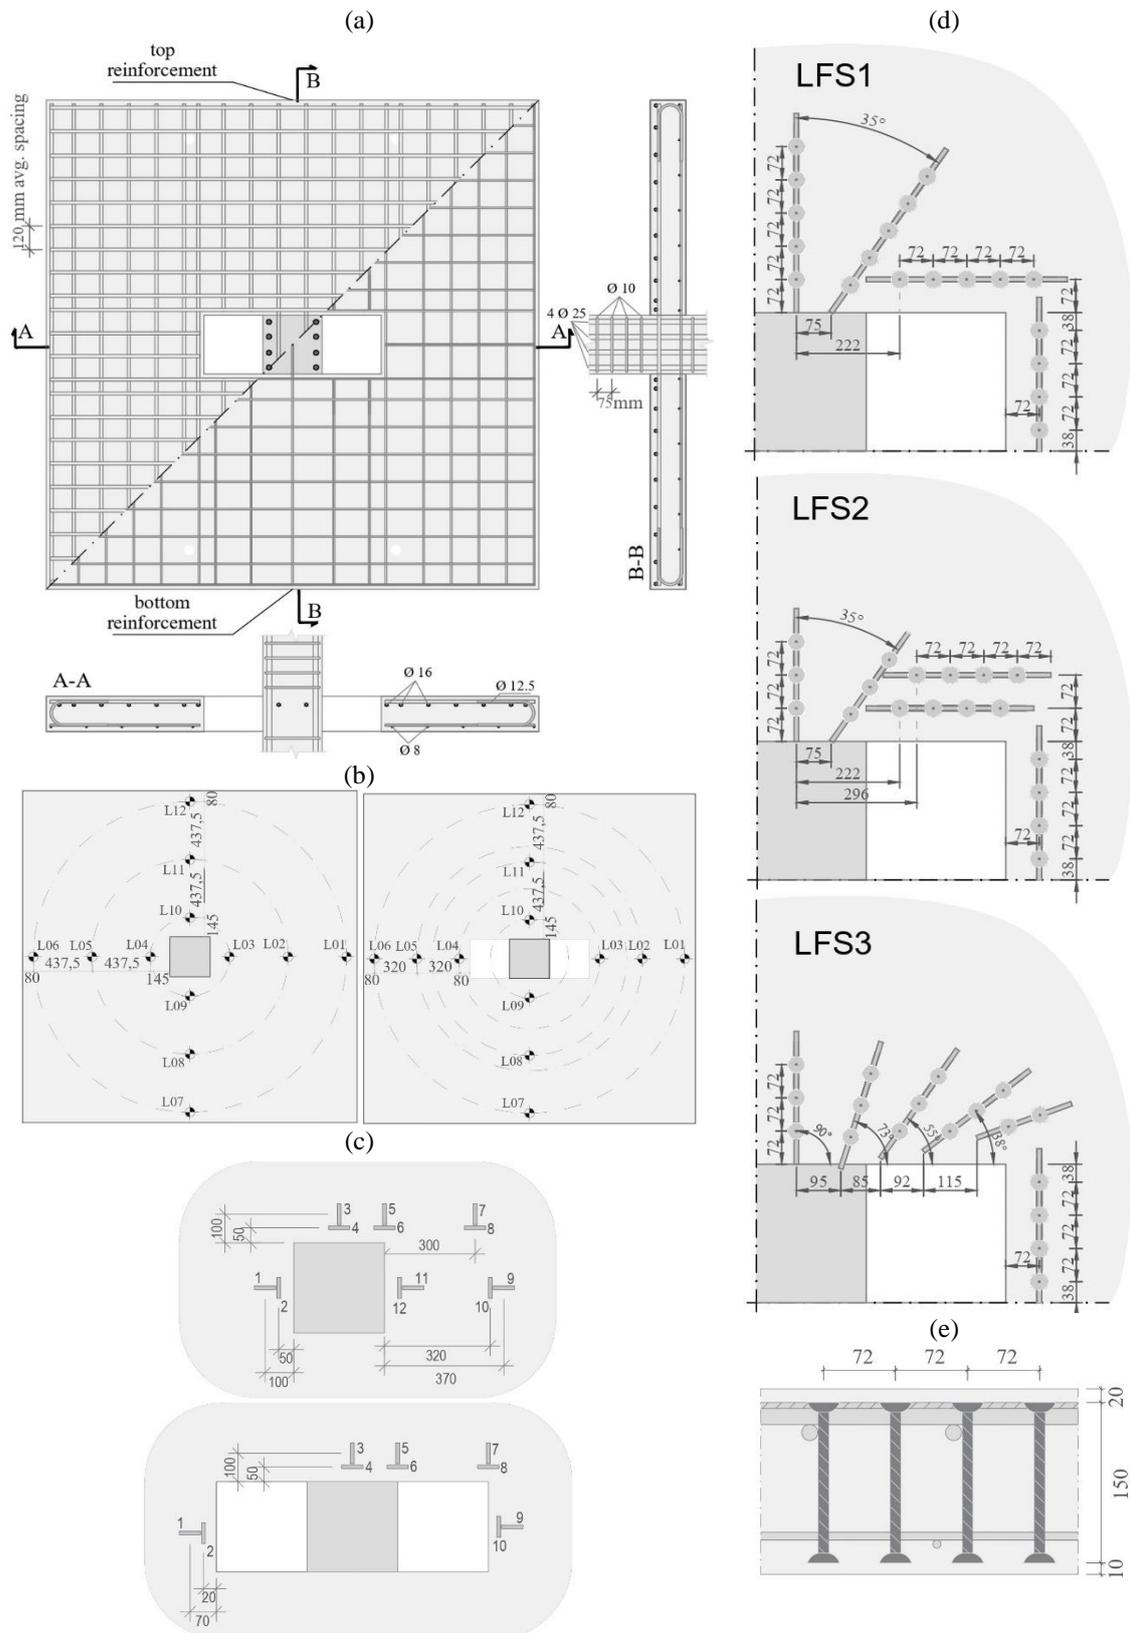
Reinforcement arrangement and instrumentation of the slabs: (a) flexural and column reinforcement arrangement; (b) LVDTs; (c) bottom concrete strain gauge position; (d) shear stud arrangement; and (e) shear reinforcement detailing (Note: units in mm)
